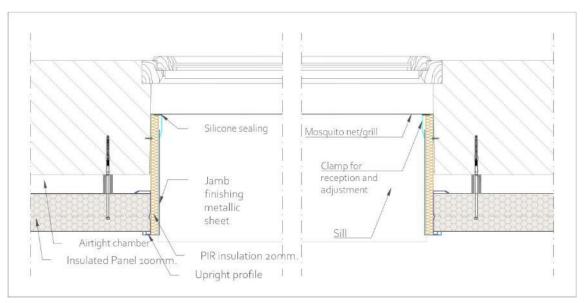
Window detail drawing (horizontal) [drawing created using AutoCAD]
